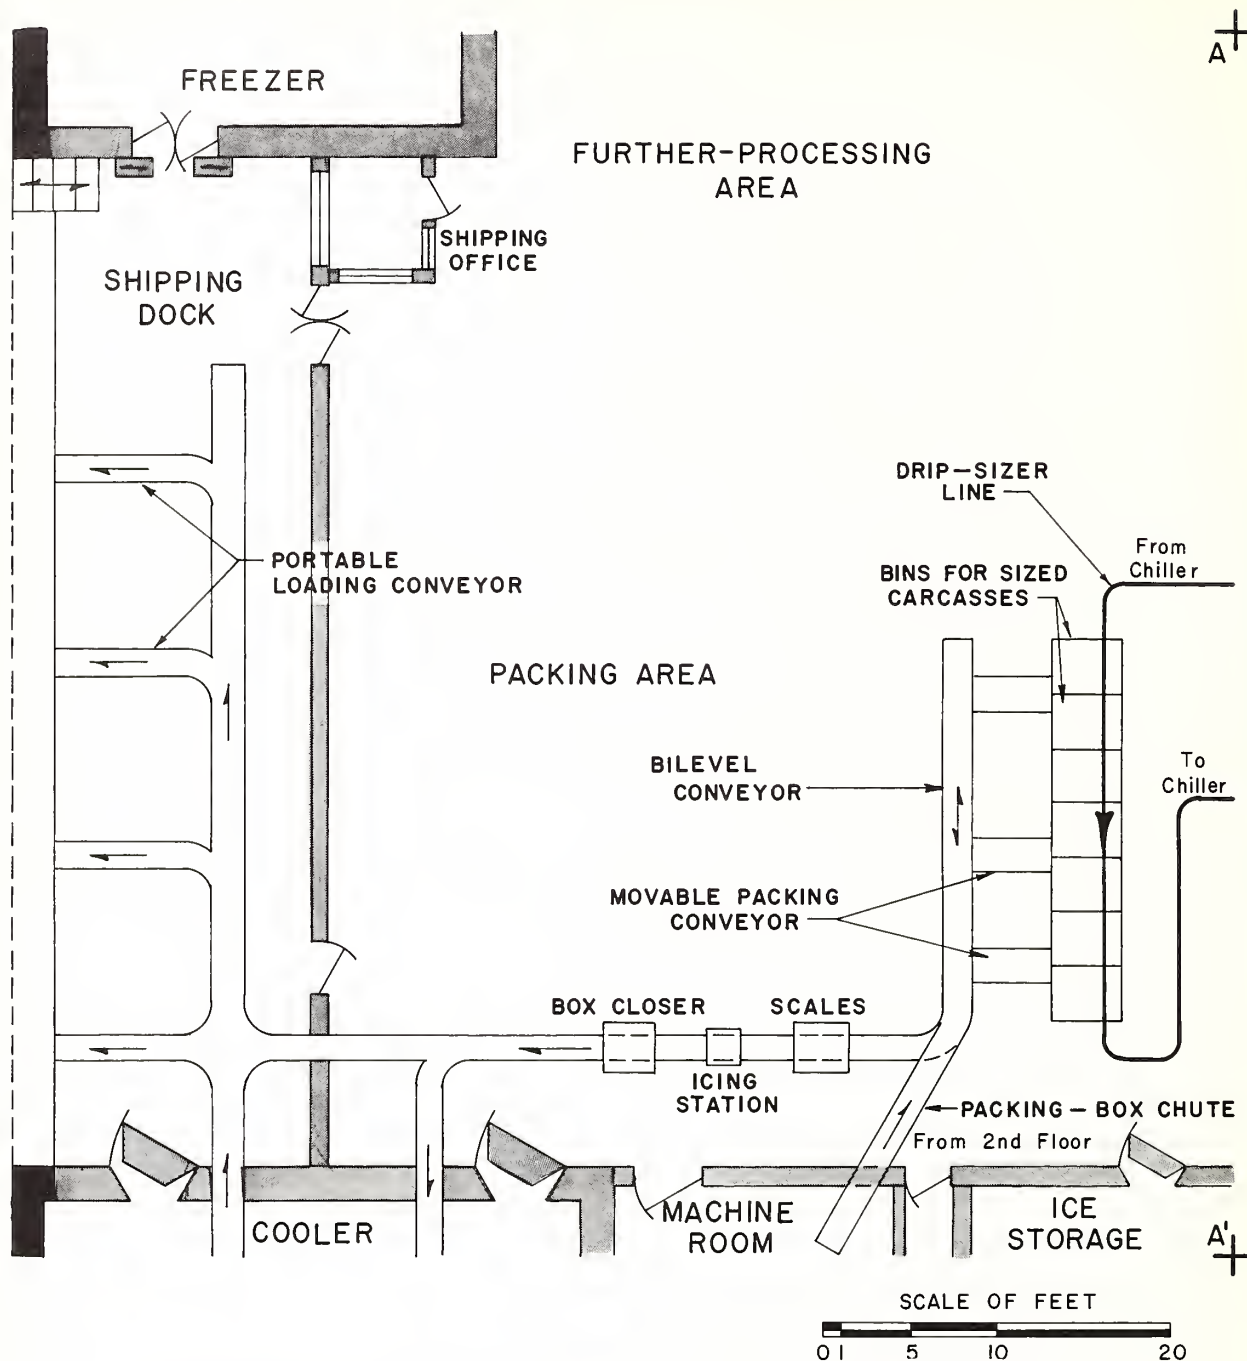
Layout of packing area and shipping dock for model poultry-processing plant. A complete layout of the plant (Plan A) is shown in figure 5.
